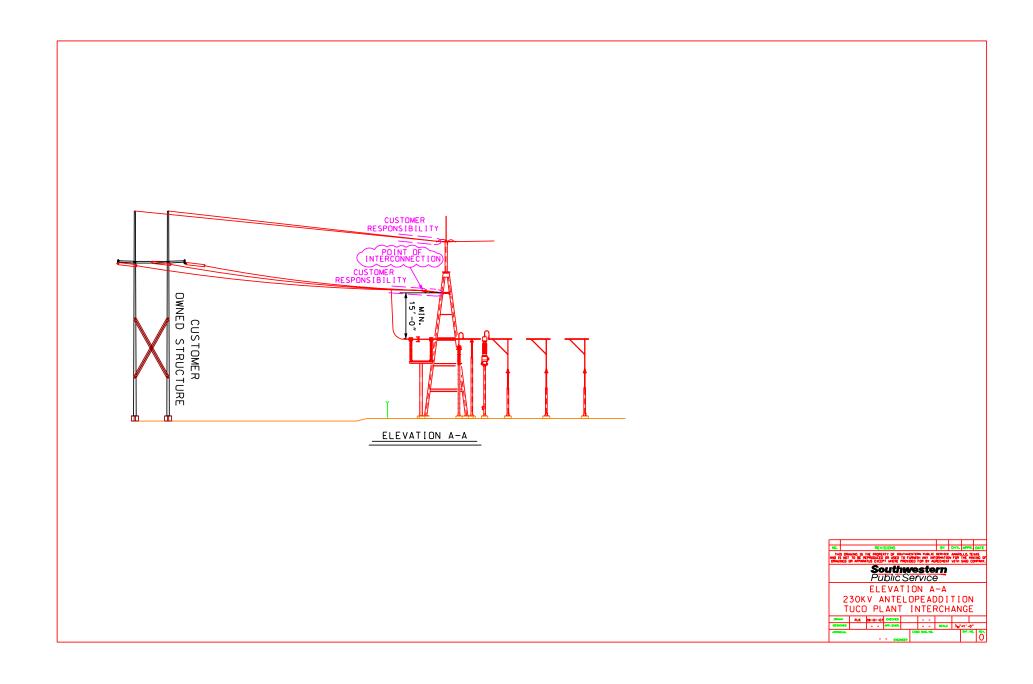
Elevation plan of interconnection of Antelope to TUCO Interchange.
